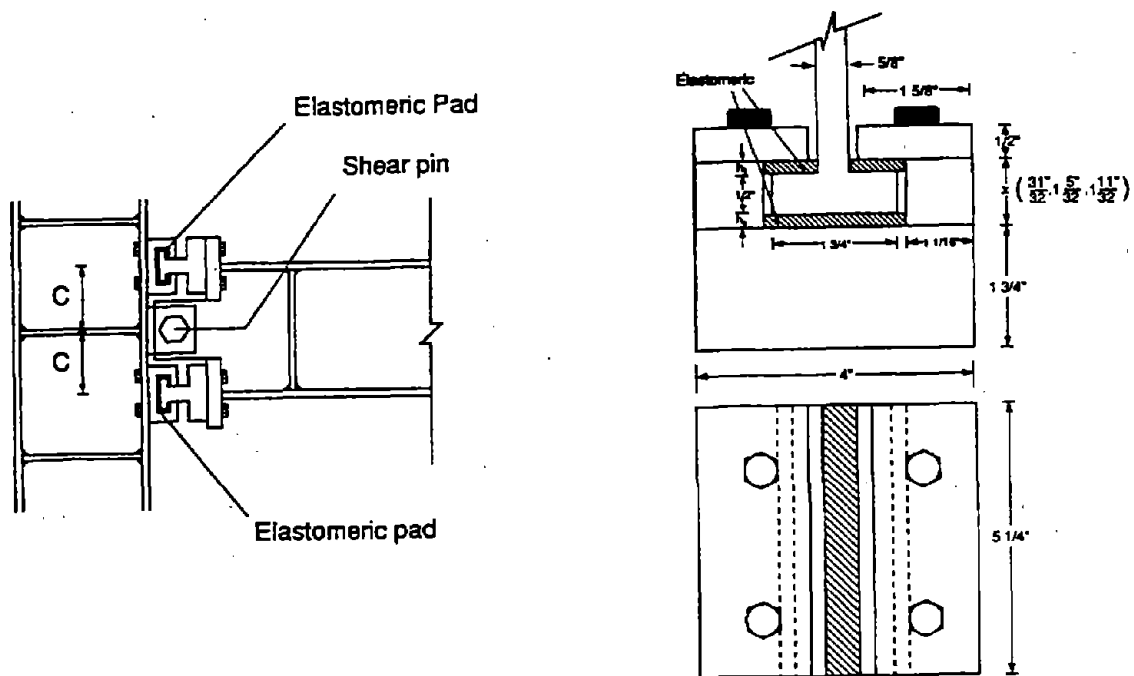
Details of beam-column connection with VE dampers (after Hsu and Fafitis, 1992).
